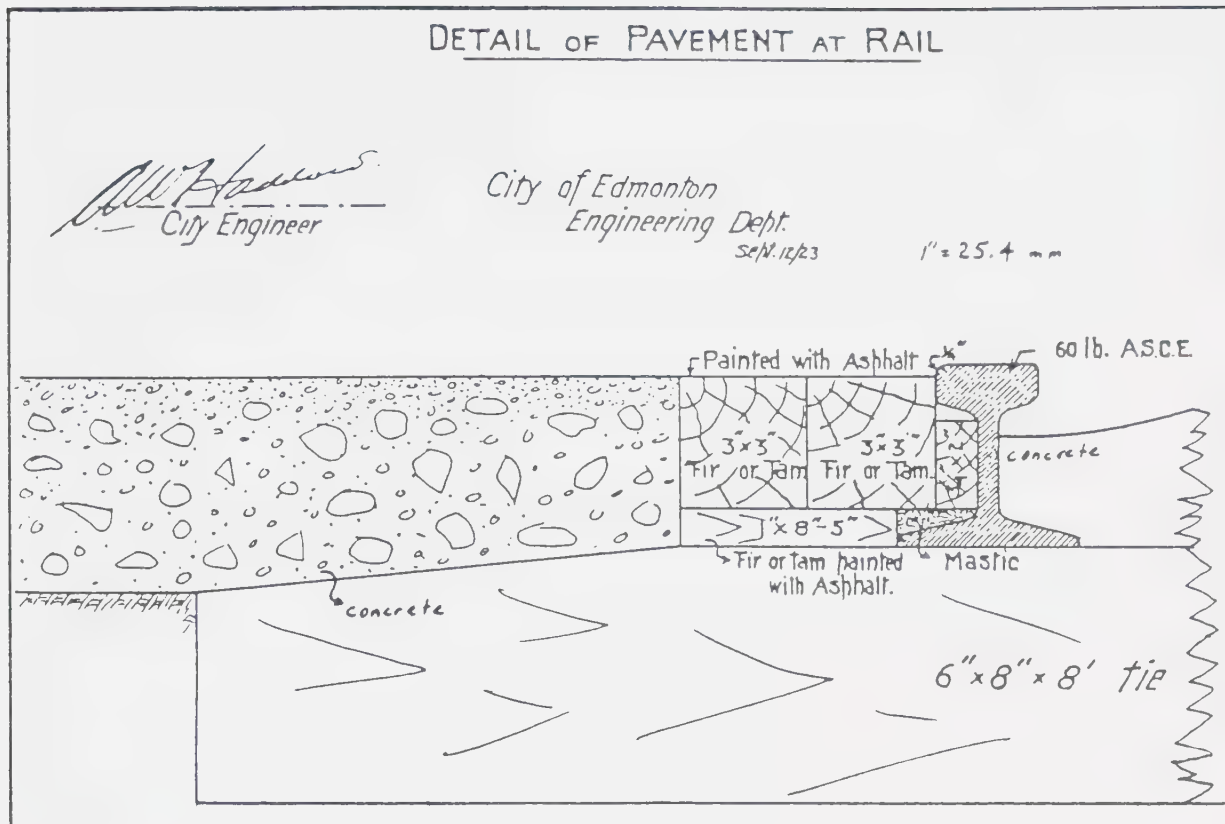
PAVEMENT USED IN 1923-1927 RECONSTRUCTION
